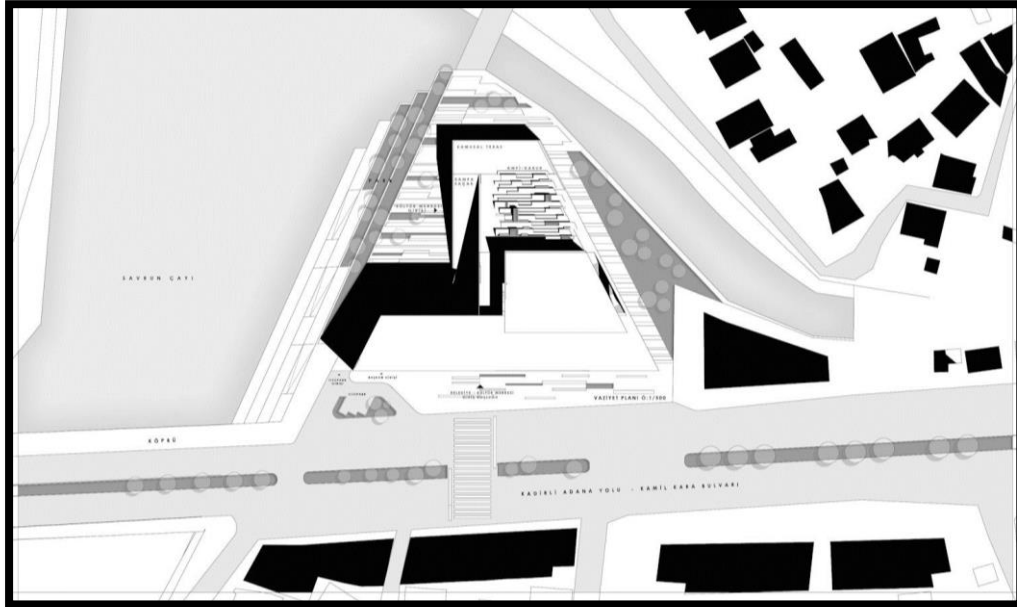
Kadirli Municipality Service Building and Cultural Center Competition, First Prize, Site plan (Anonymous, 2009)
